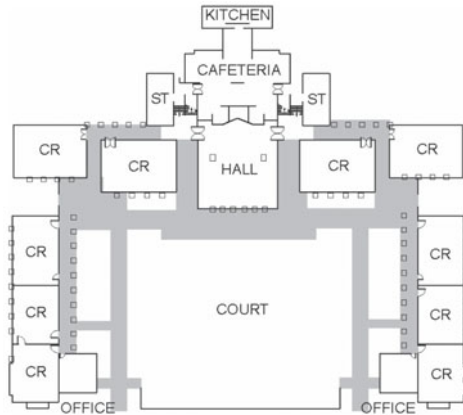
Floor plan of Jiyu Gakuen School, Tokyo.
